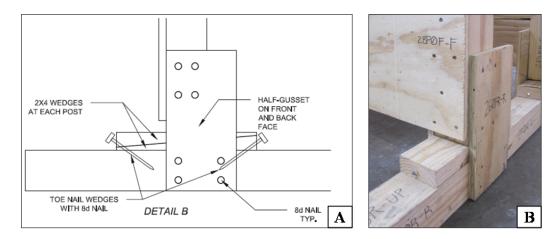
Wedge Design A) Drawing Detail B) Photograph of Wedge
